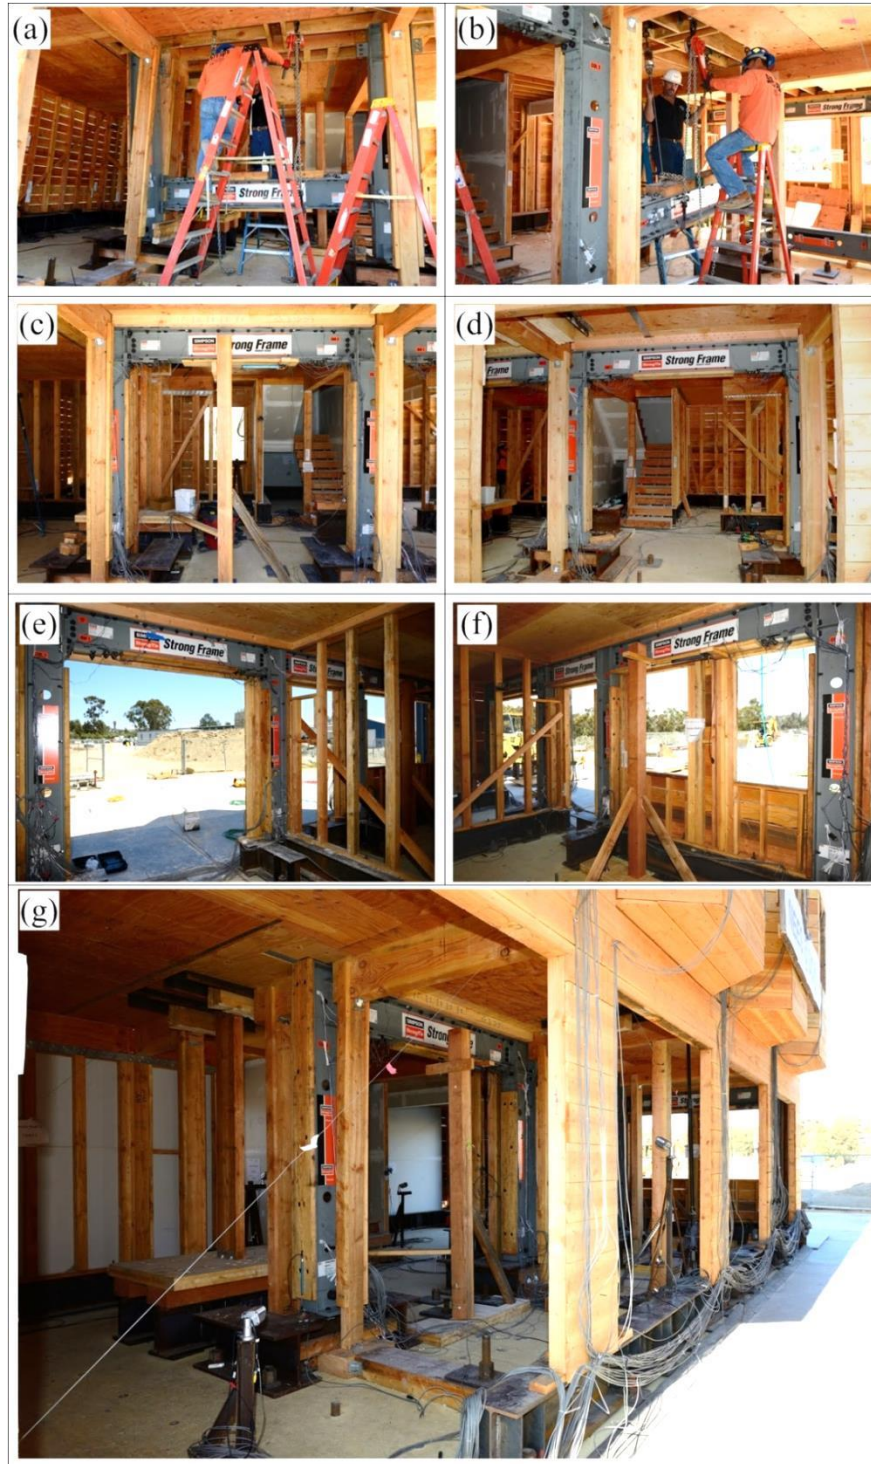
SMF retrofits at the first floor: (a) installation of west span of SMF in Line D, (b) installation of east span of SMF in Line D, (c) West span of SMF in Line D, (d) East span of SMF in Line D, (e) North span of SMF in Line 5; (f) South span of SMF in Line 5; (g) view of SMF installed in Line D from outside of the building.
